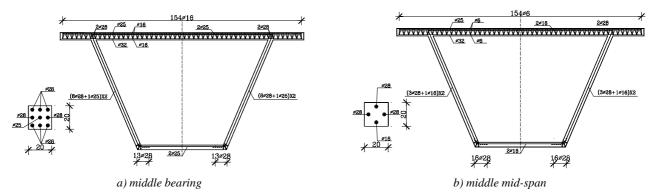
Box girder reinforcement in characteristic cross-sections of the bridge
